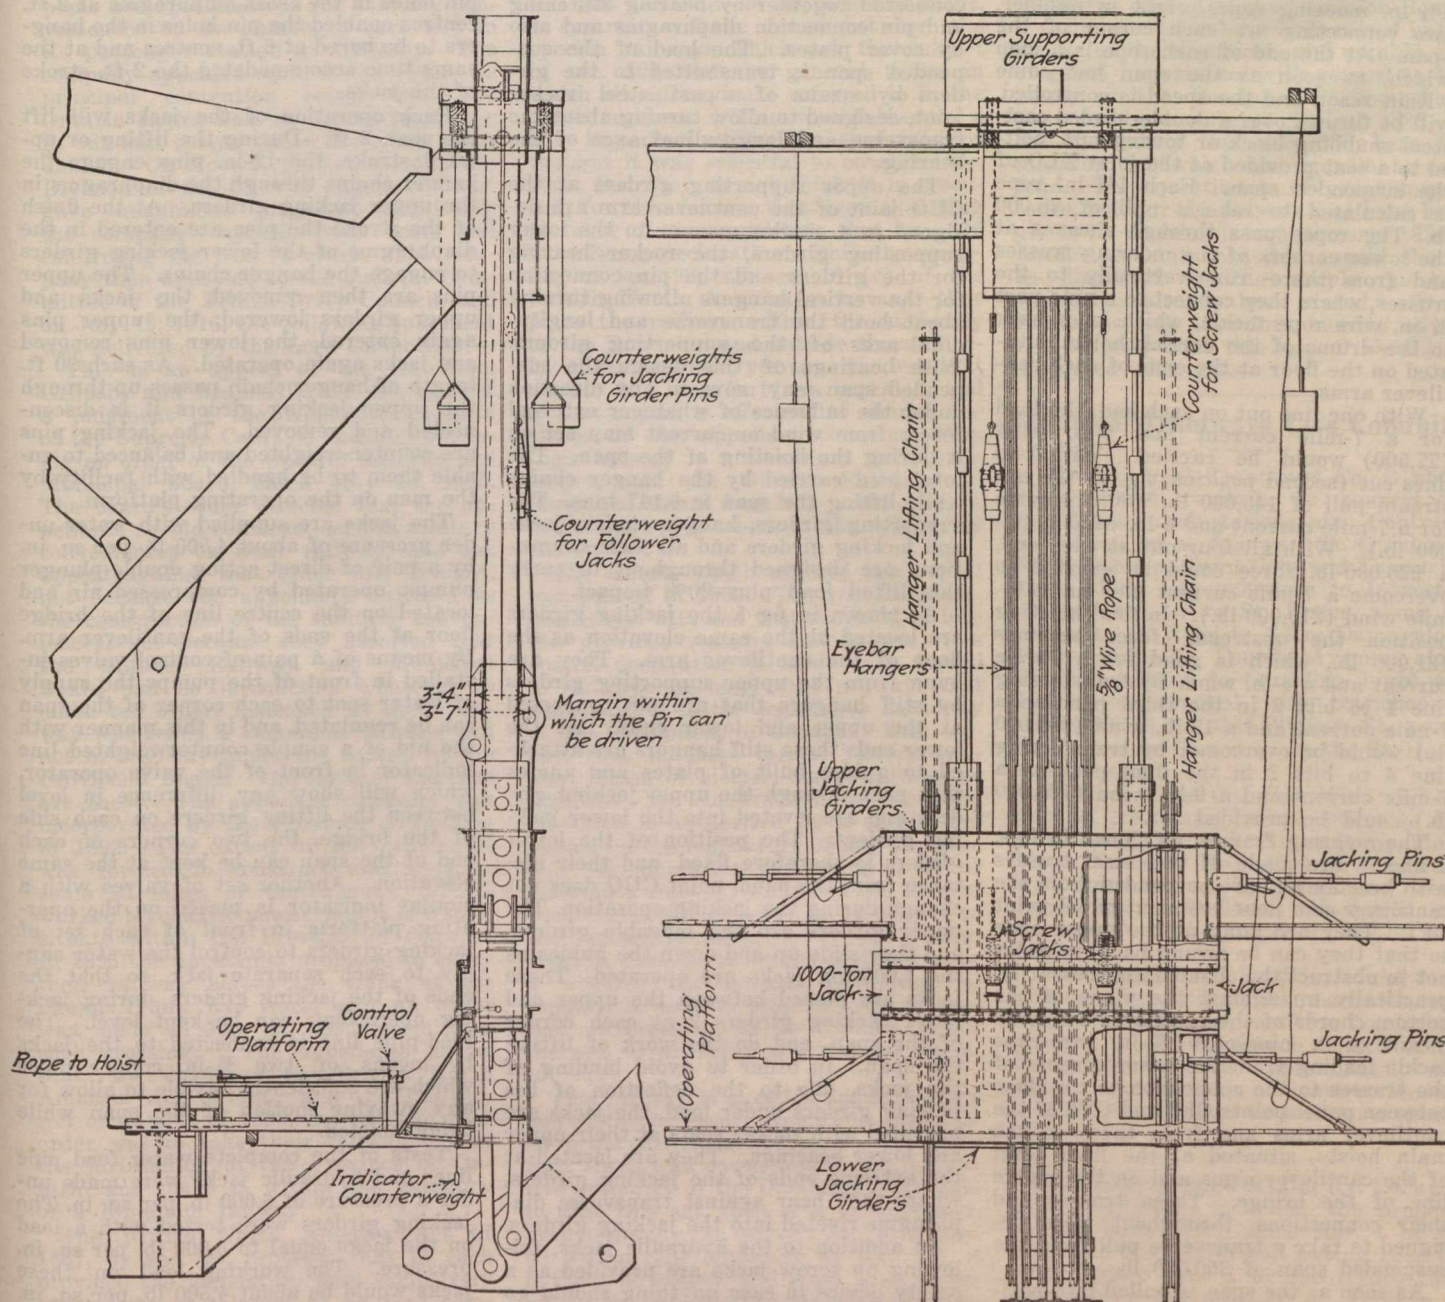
Jacking equipment for hoisting suspended span, Quebec Bridge.
